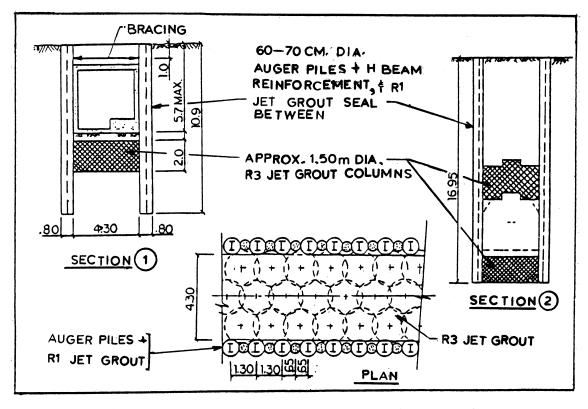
Jet grouting applications to enable cut and cover (Section 1) and tunnelled excavation (Section 2) for new sewer construction, Torre Annunziata, Napoli, Italy
